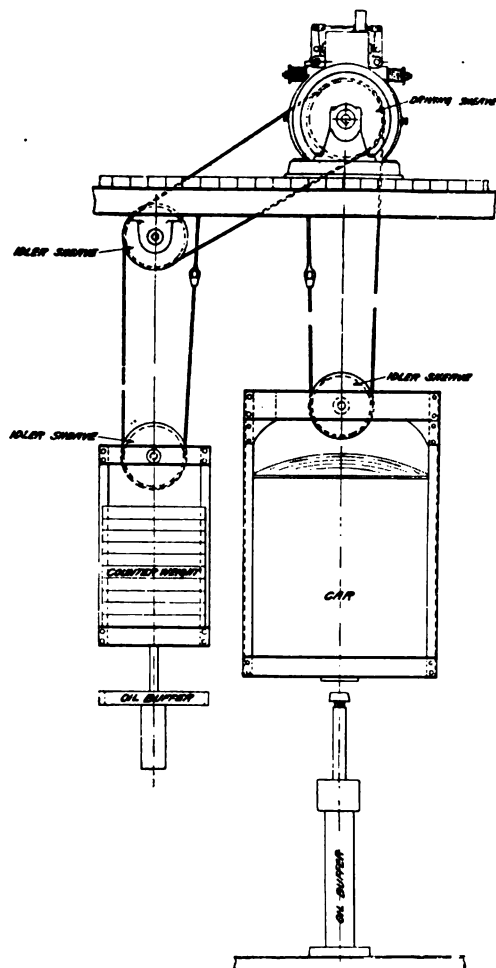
2:1 ROPING OF A GEARLESS TRACTION ELEVATOR
